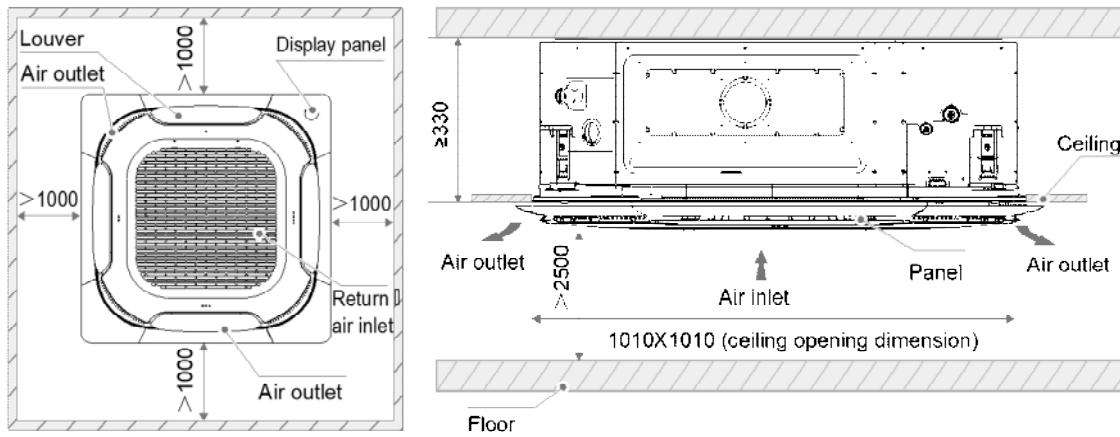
2.8-14.0kW space requirements (unit: mm)
